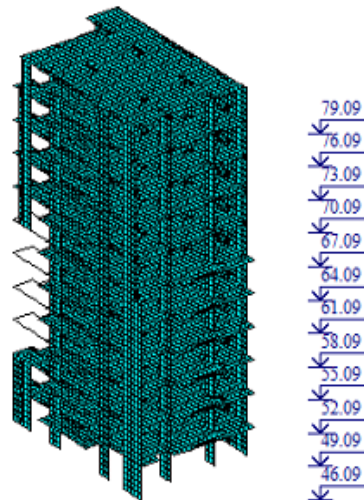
Digital Shadow of the building at 6A Lobanovsky Avenue in Kyiv with damaged elements on floors 18-21
